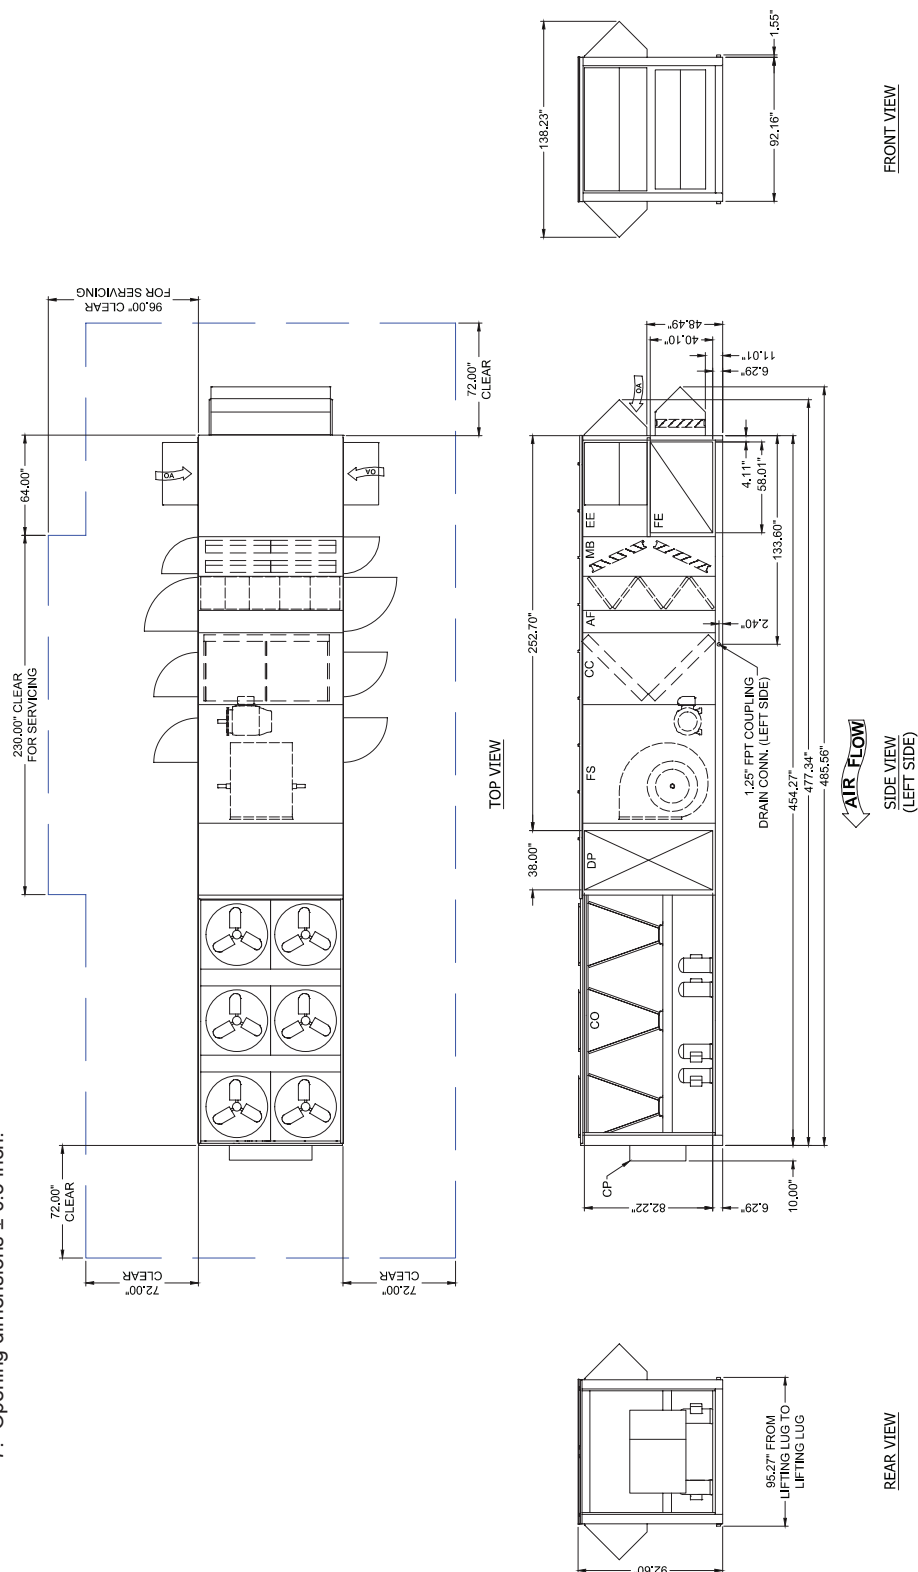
GENERAL ARRANGEMENT DRAWING
